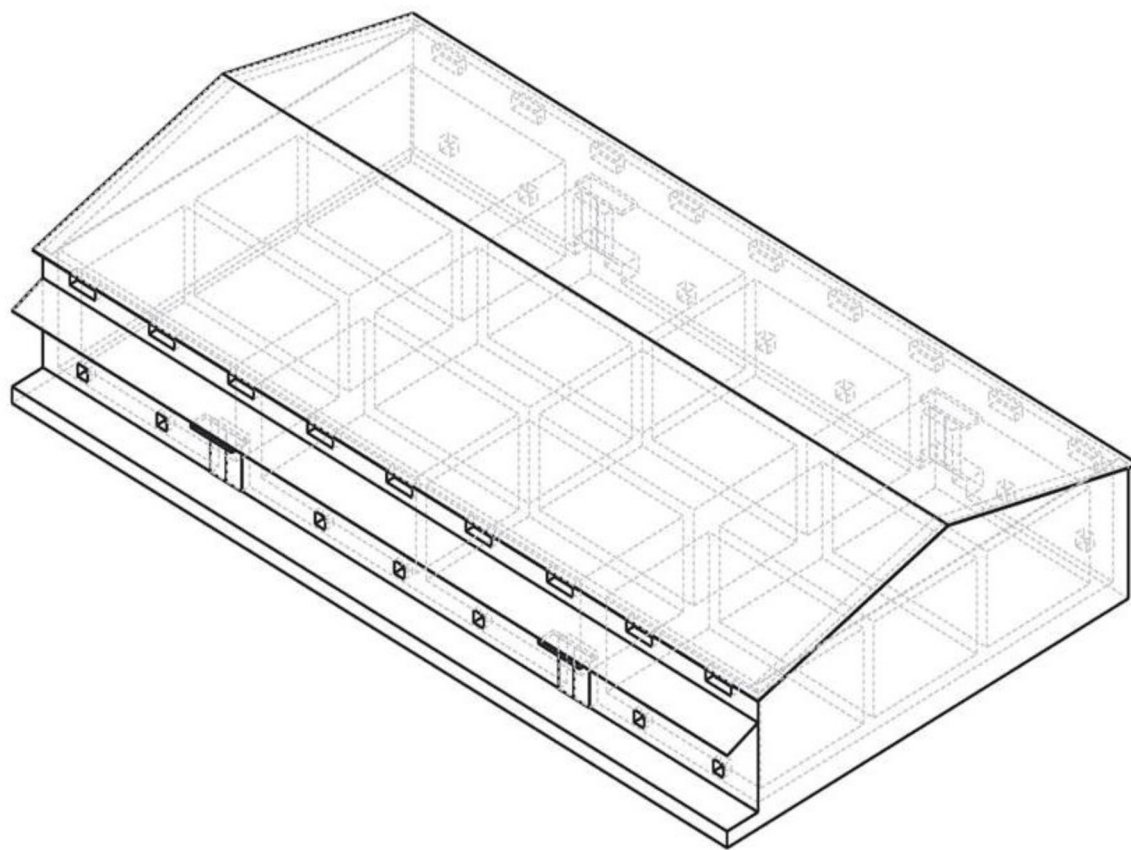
| A typical bag storage structure with stacking floor plan.
